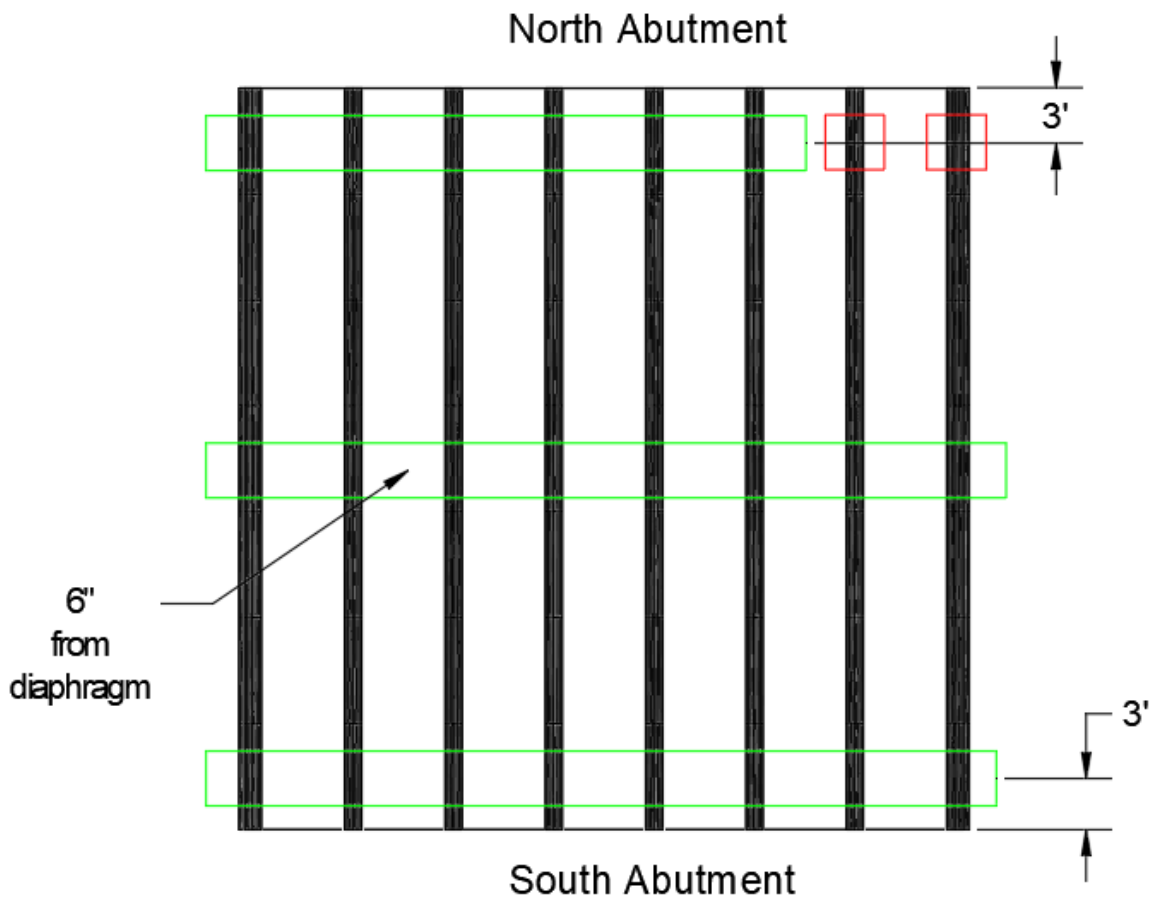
Plan View of Sensor Layout for 2<sup>nd</sup> Yutan Bridge Load Test
